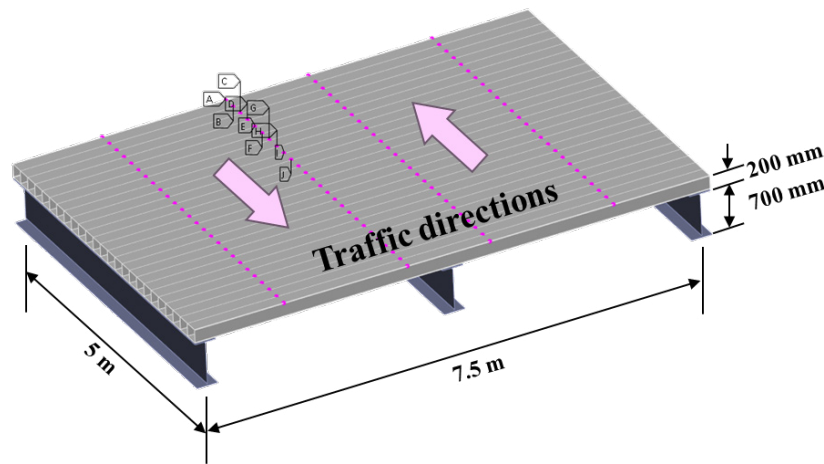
FRP deck steel girder panel dimensions and traffic loads (details see Section 2.2.2 and 2.2.3).
